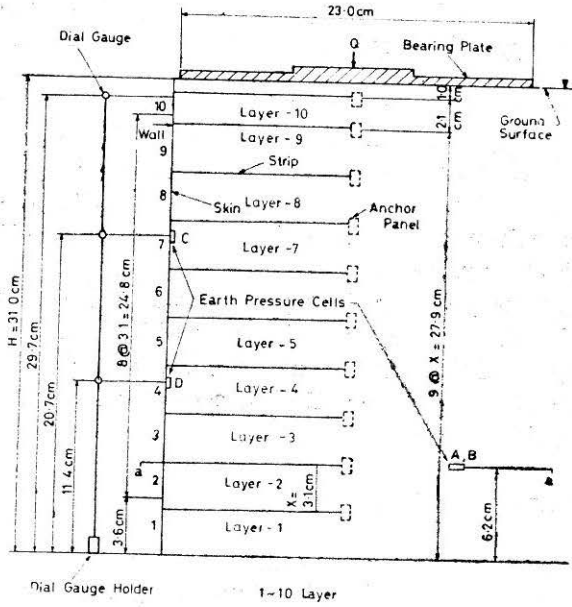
(a) Cross Section of Reinforced Earth Wall
